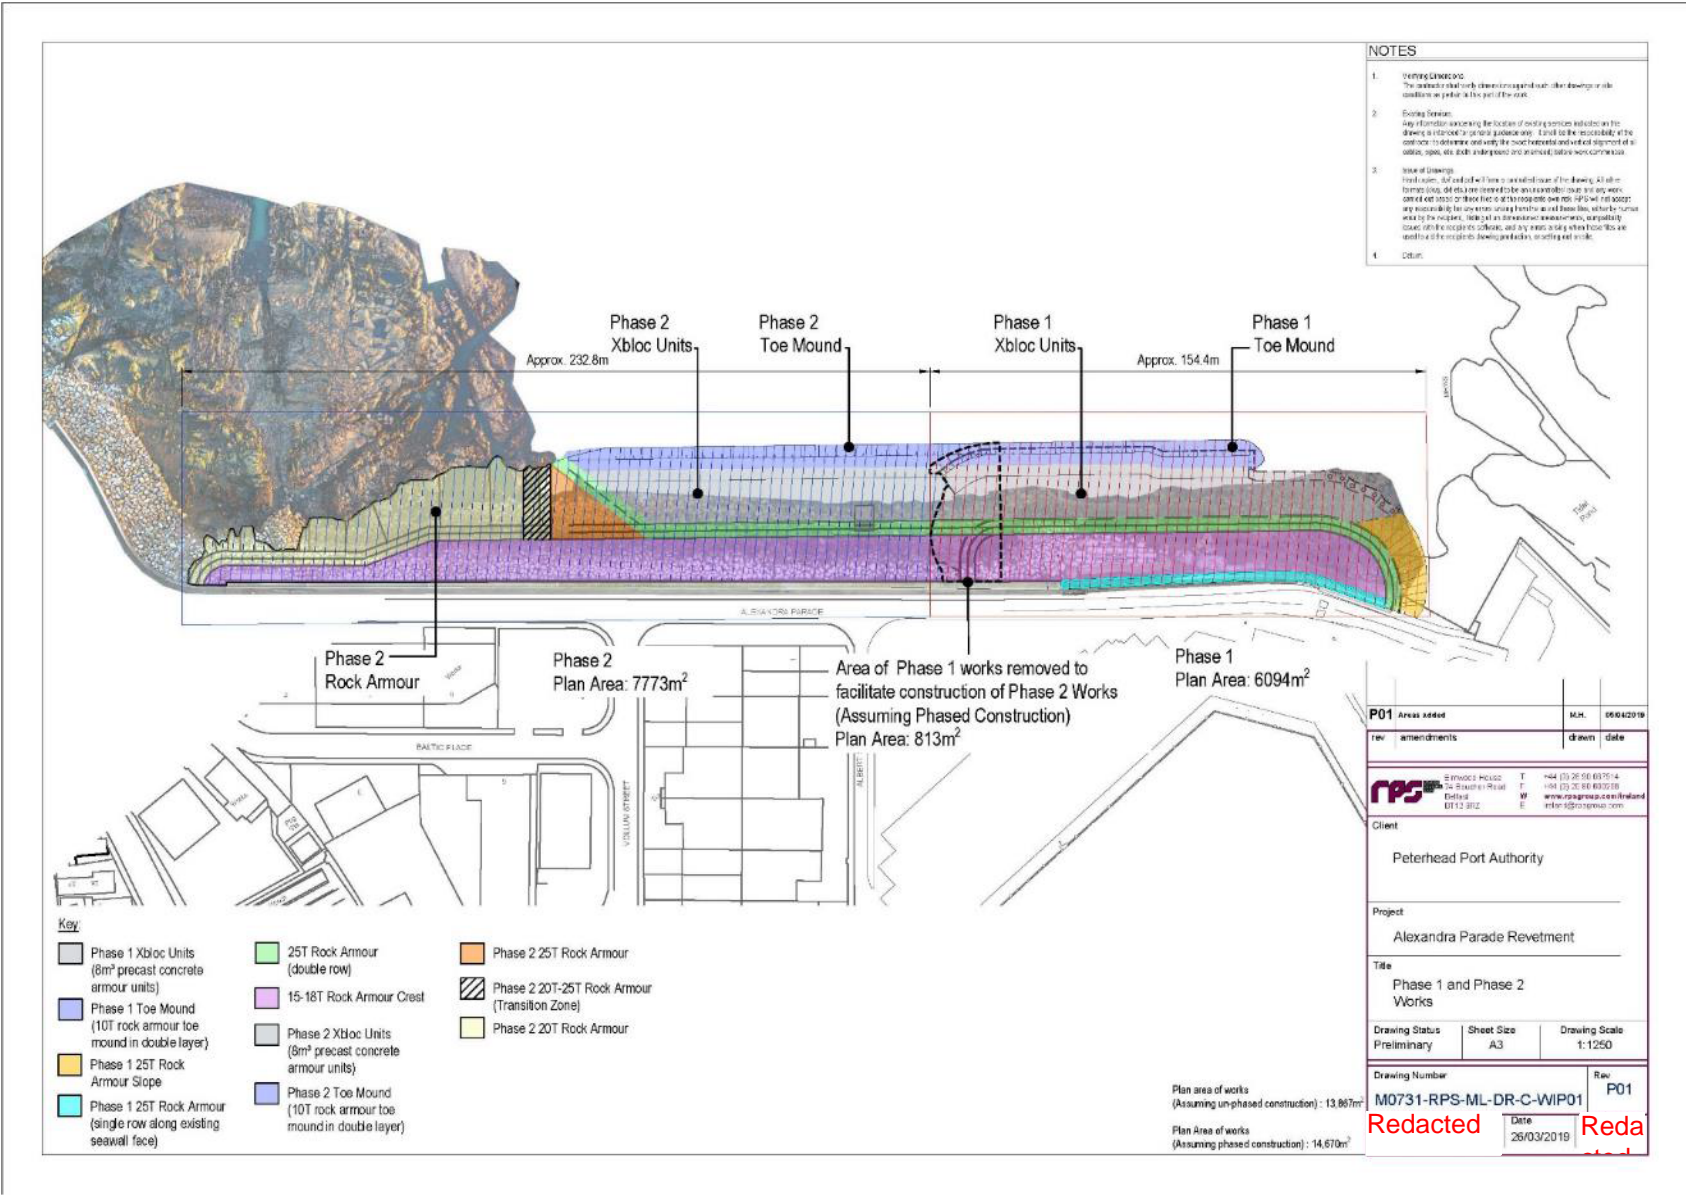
Proposed layout of revetment and location of rock armour sections, concrete units.
